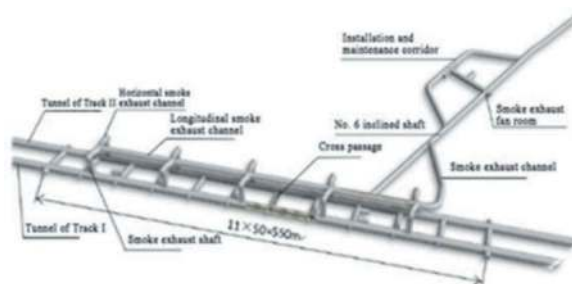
Diagram of the structural layout of the New Guanjjiao Tunnel emergency rescue station.
